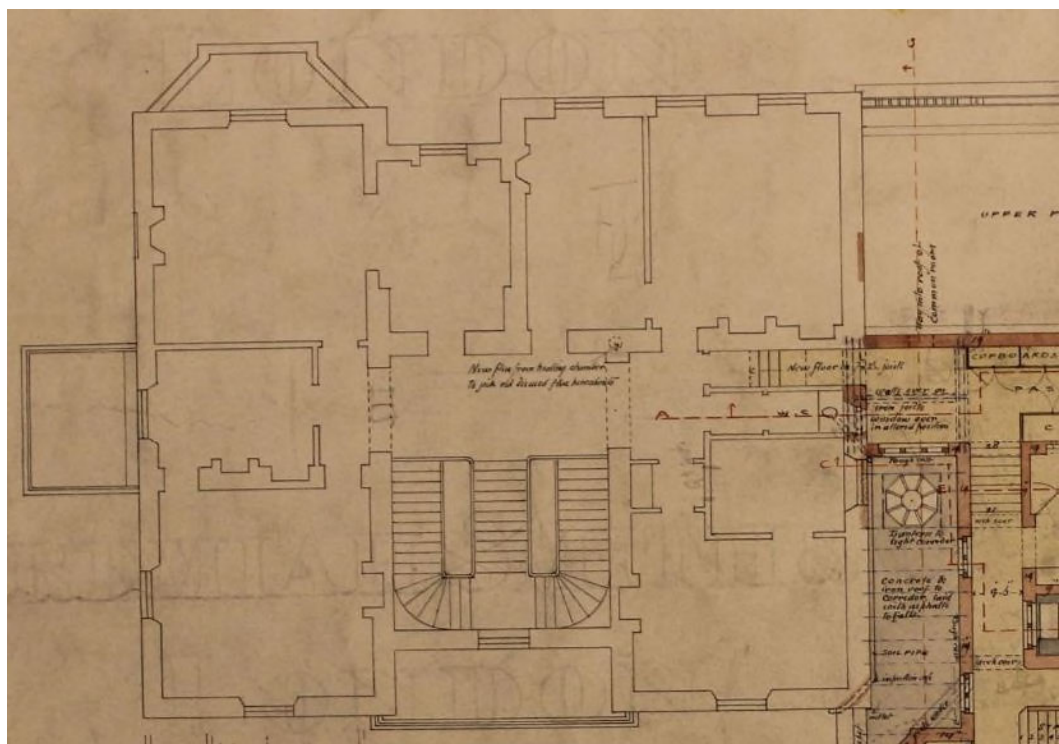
Philip Webb's first floor plan showing the Nash part of the house in 1898. © SPAB Archive.
